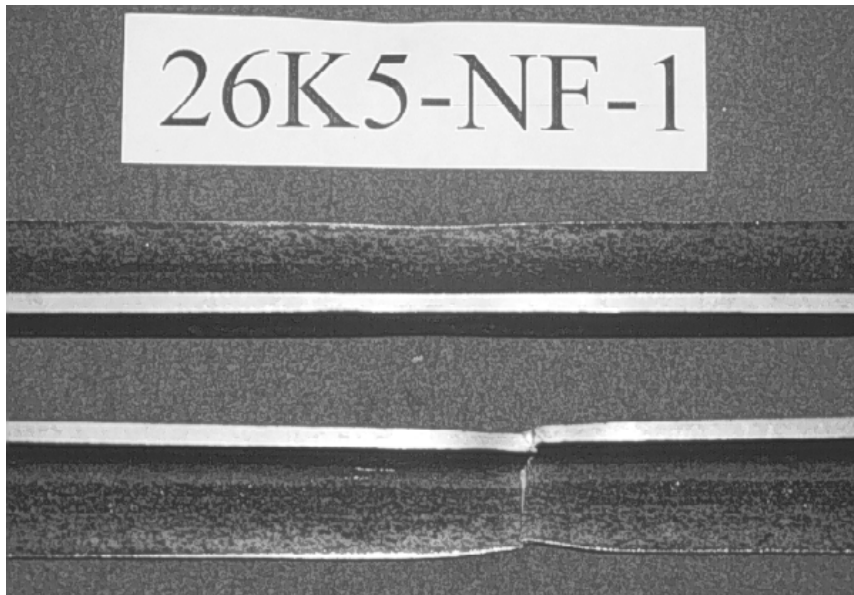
Failures in 26K5 Specimens with No Fasteners
